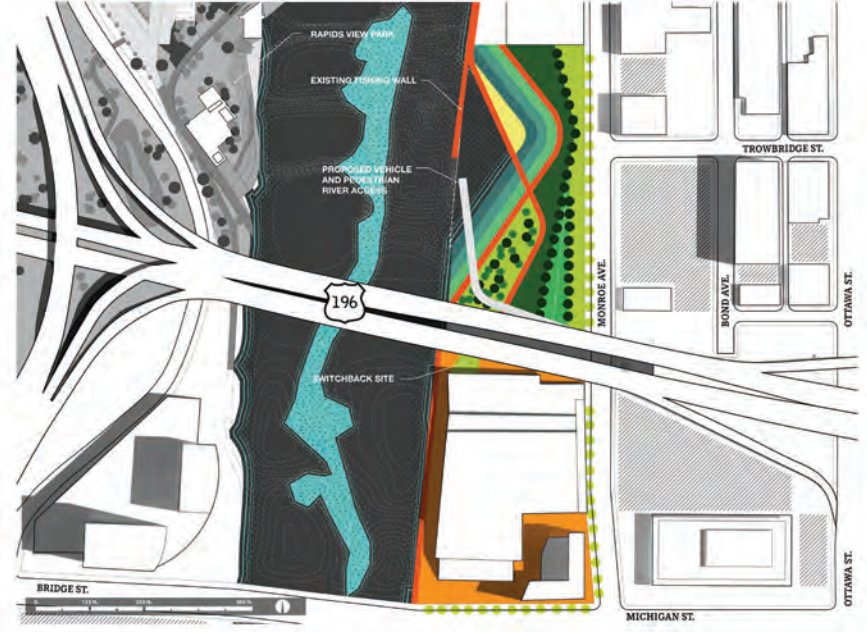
Proposed MSU / City / KC site plan - Alternate 4
